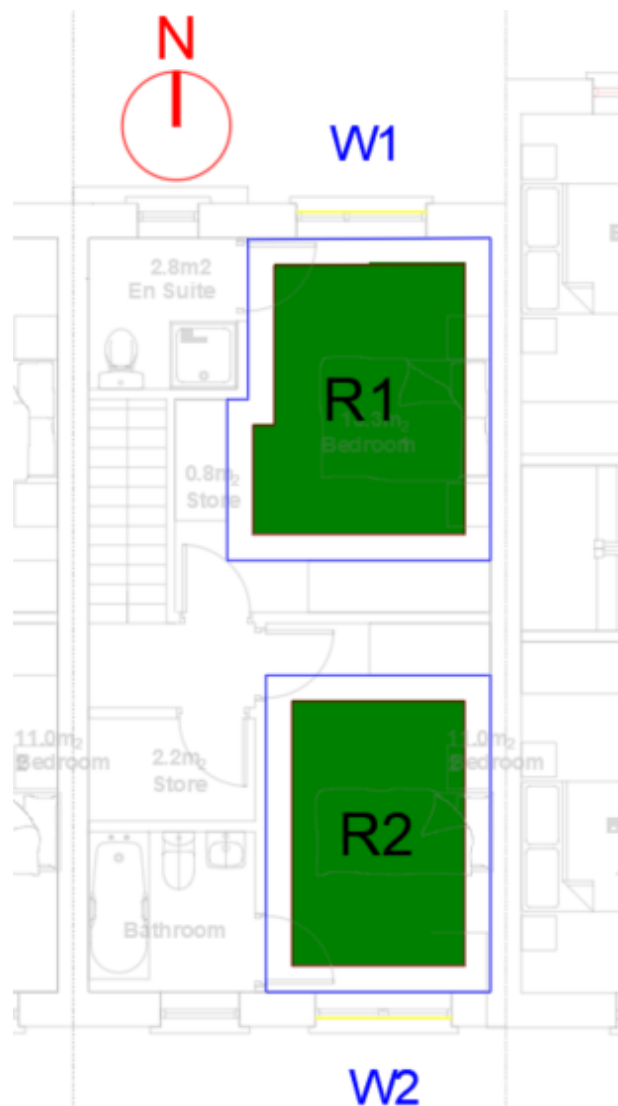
Proposed First Floor sDA Contours of House G-02 2-054
